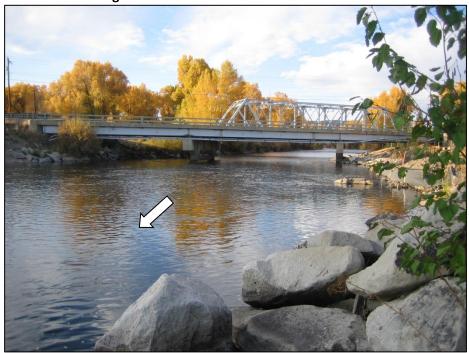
(J-09-AB) Looking toward the downstream face of the structure
